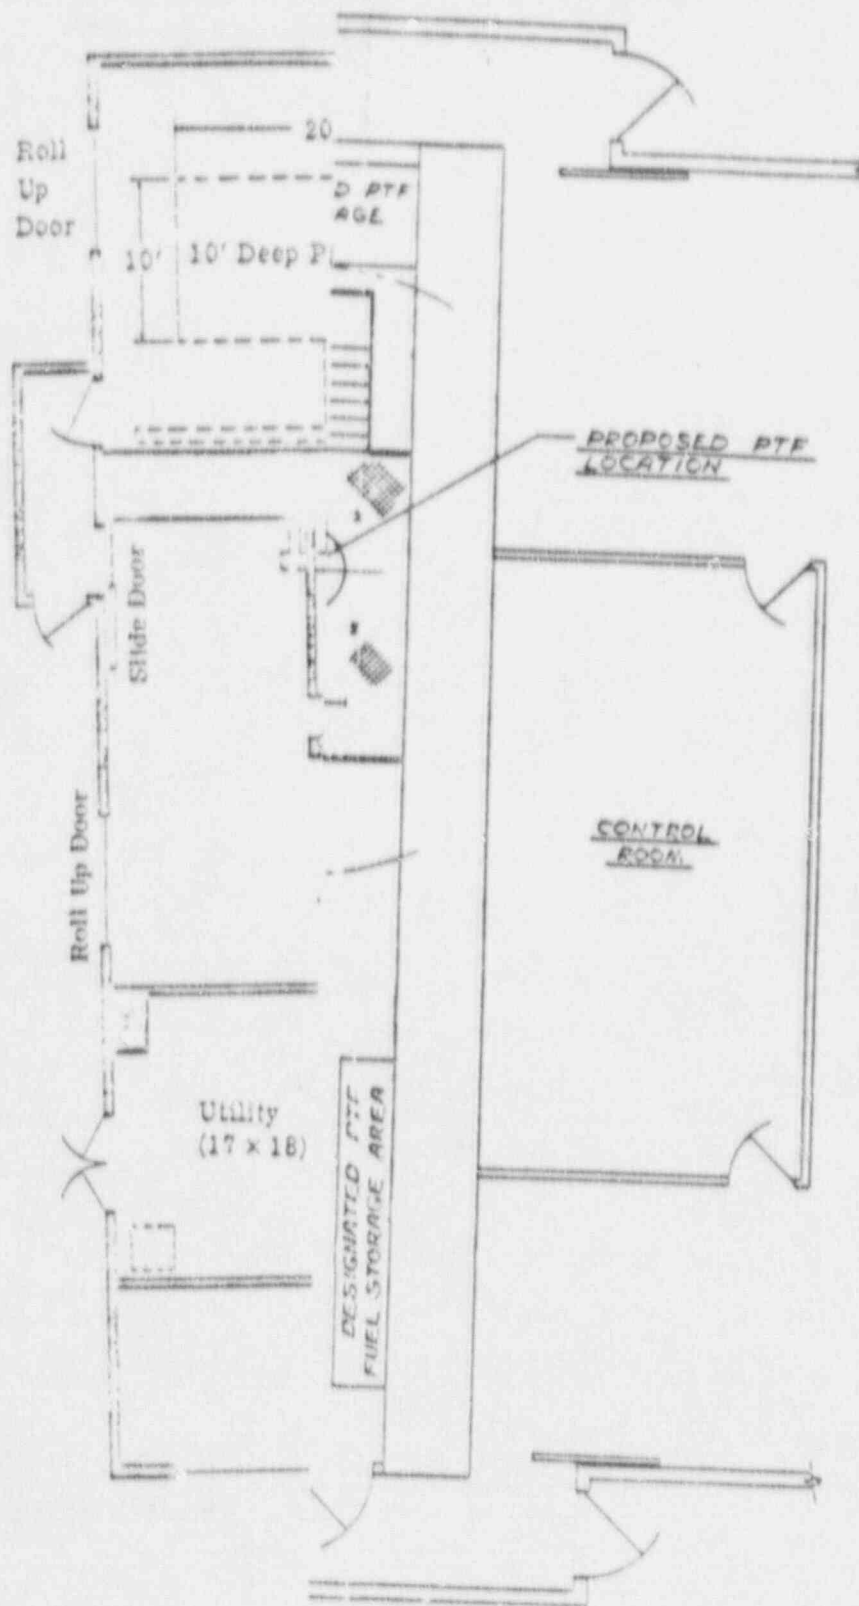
Critical Experiment Facility Building — Floor Plan with Revised Detail of Reactor Room
